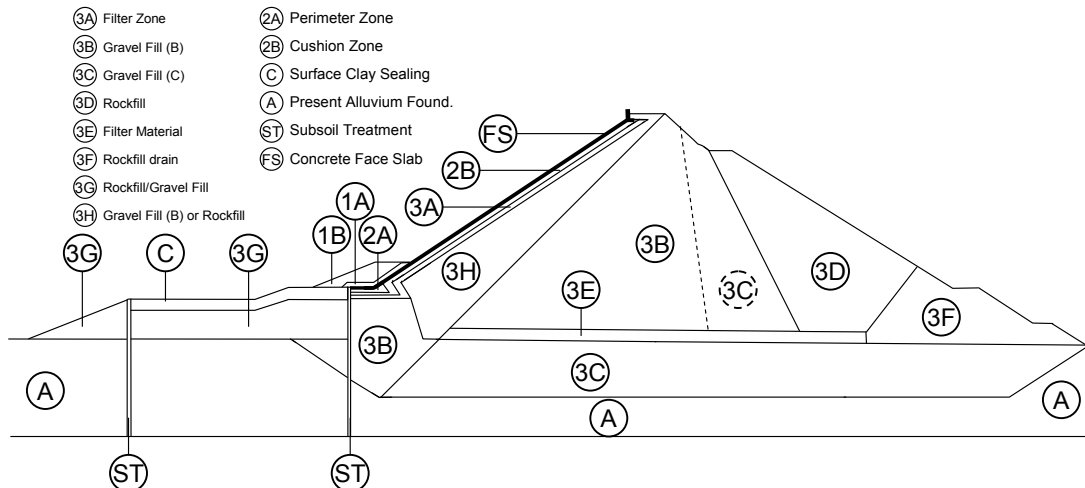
Guideline design for the CFSGD with basement drain, special zoning and deep foundation (adjusted after ANCOLD, 1991; ICOLD, 2005)
